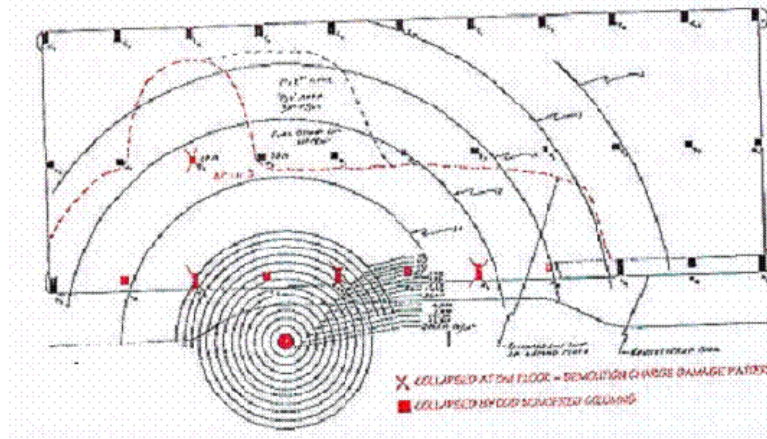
Diagram showing elements damaged by initial blast adjacent to Murrah Federal Building
